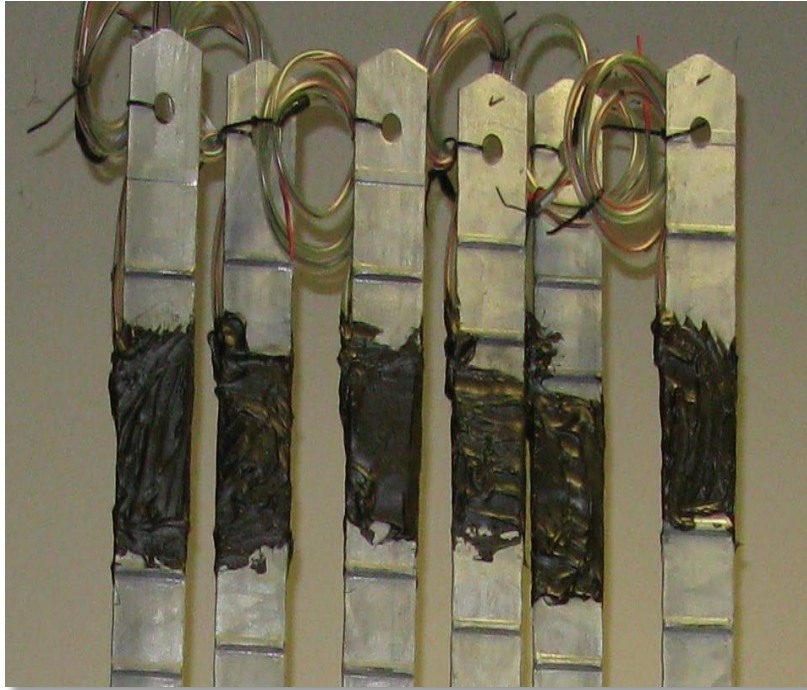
Protecting strain gauges and connectors using PVC tape
